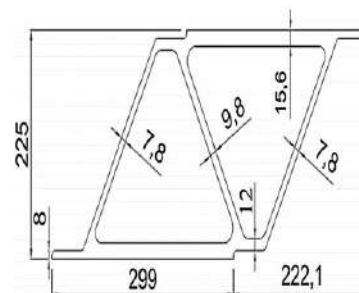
An example of a triangular cross section geometry in an FRP deck [1]
